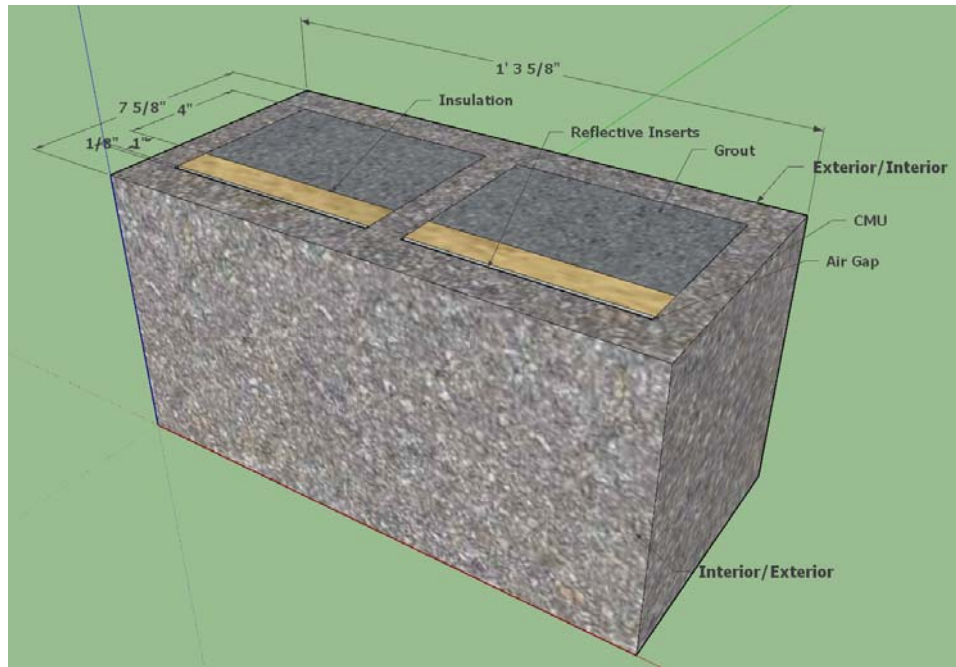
Grouted CMU Wall with Rigid Reflective Insulation Insert
